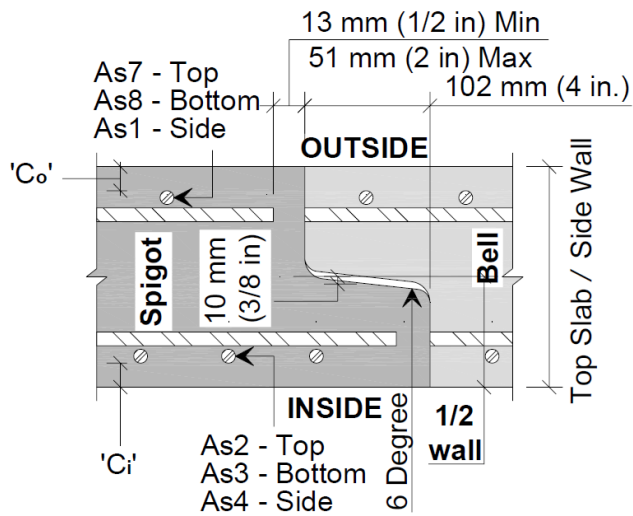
Connecting two box culverts through bell and spigot [23]
